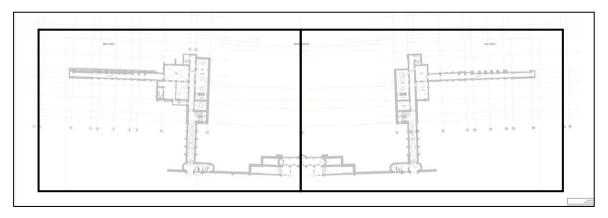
\_Union Buildings\_Overall Basement Floor Plan with western and eastern sections (Source: Drawing Ikemeleng Architects, 2017)
